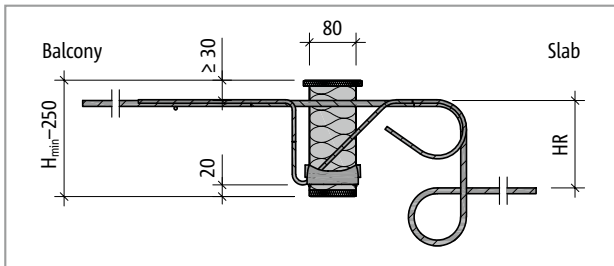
Schöck Isokorb® T type K-BH: Product section
